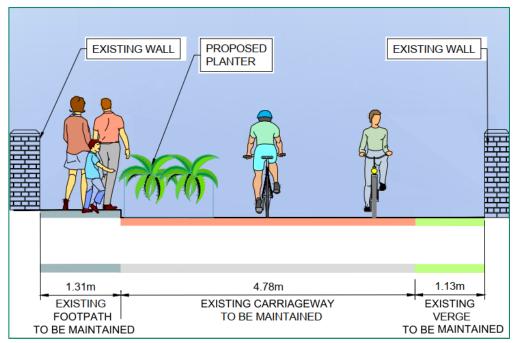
Cross Section of Filtered Permeability Section of the Scheme (Source: NTA Drawing 60615775-NTA-SLW_ZZ-S039_XX_00-DR-KK-0002)
